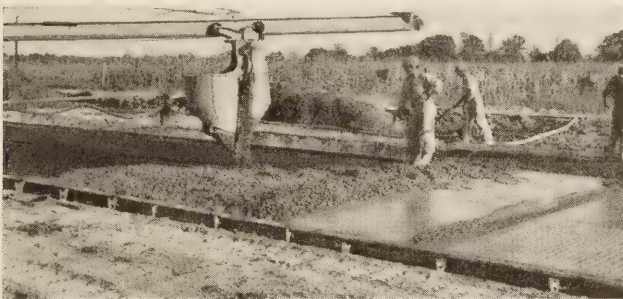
CONCRETE BEING PLACED IN A HEAVILY REINFORCED SECTION.
